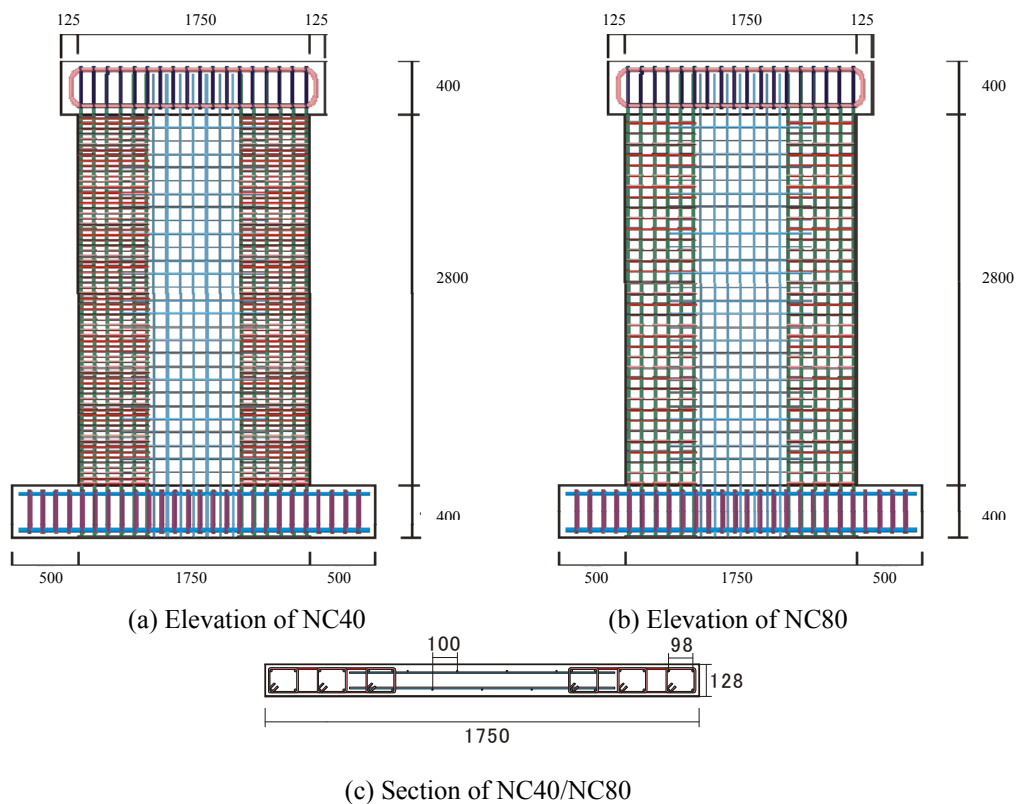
Dimensions and reinforcement arrangement (Unit: mm)
